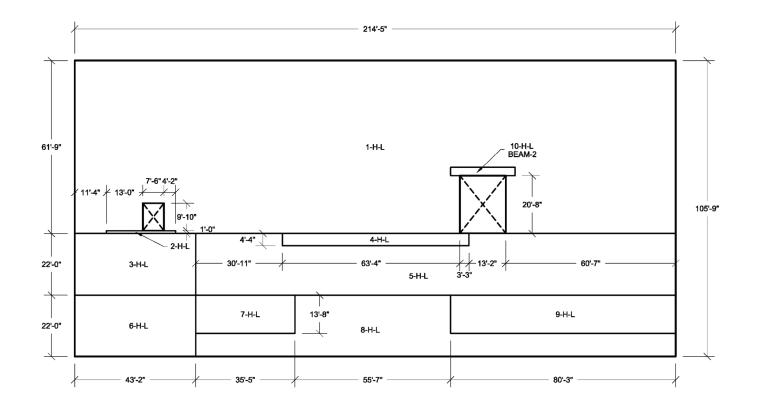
H.3-10 North Wall Looking South Horizontal Reinforcement Zones Far Side Face
